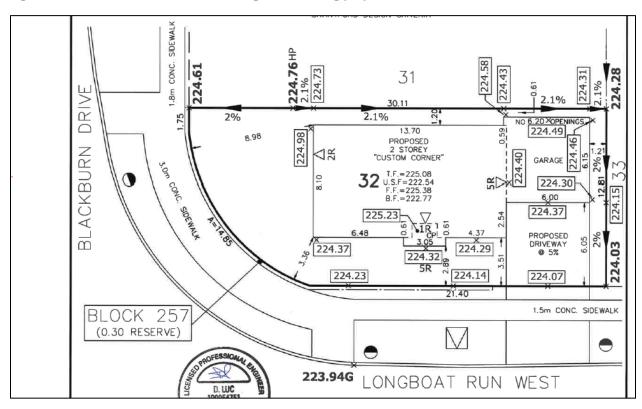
Zoomed-in version of Lot Grading Plan showing proposed setbacks
